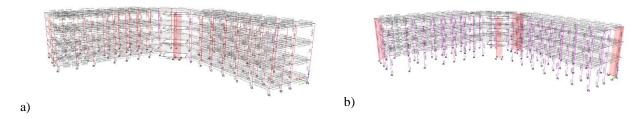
Structural analysis and design in etabs, a. O/S sections before retrofitting, b. Pass sections after retrofitting
